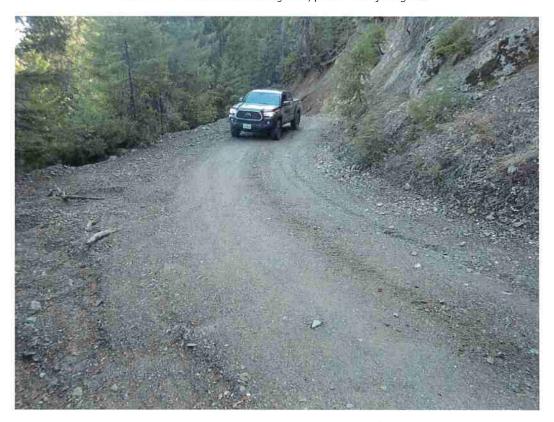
RP 21. Vehicle traveling west, photo taken facing east.
